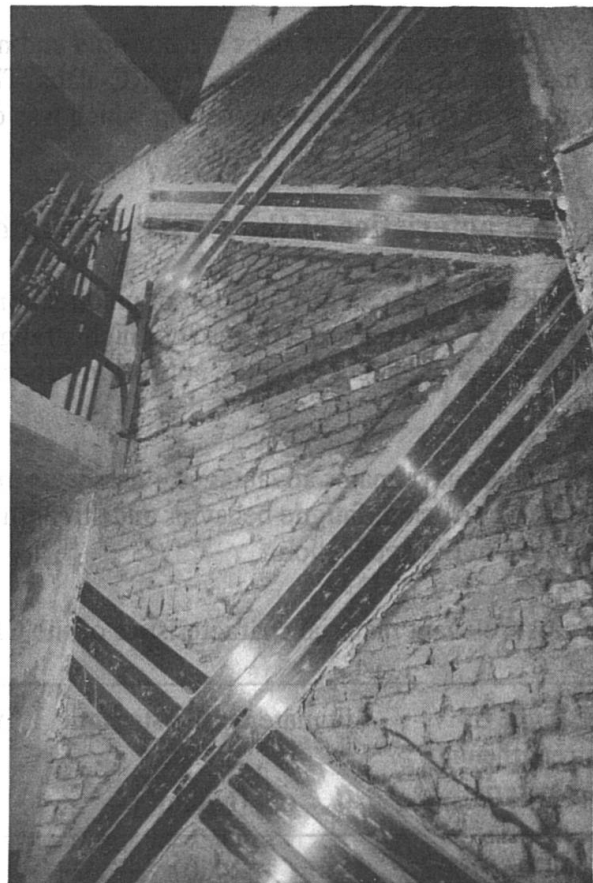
Distribution of CFRP-sheets on masonry shear wall
